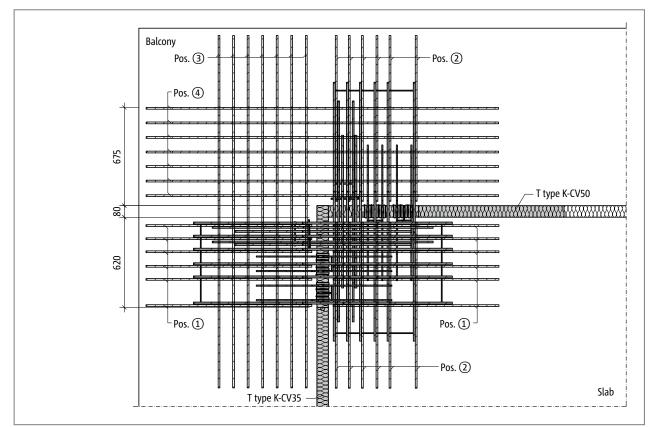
Schöck Isokorb® T type C-M2: On-site reinforcement (top position)
